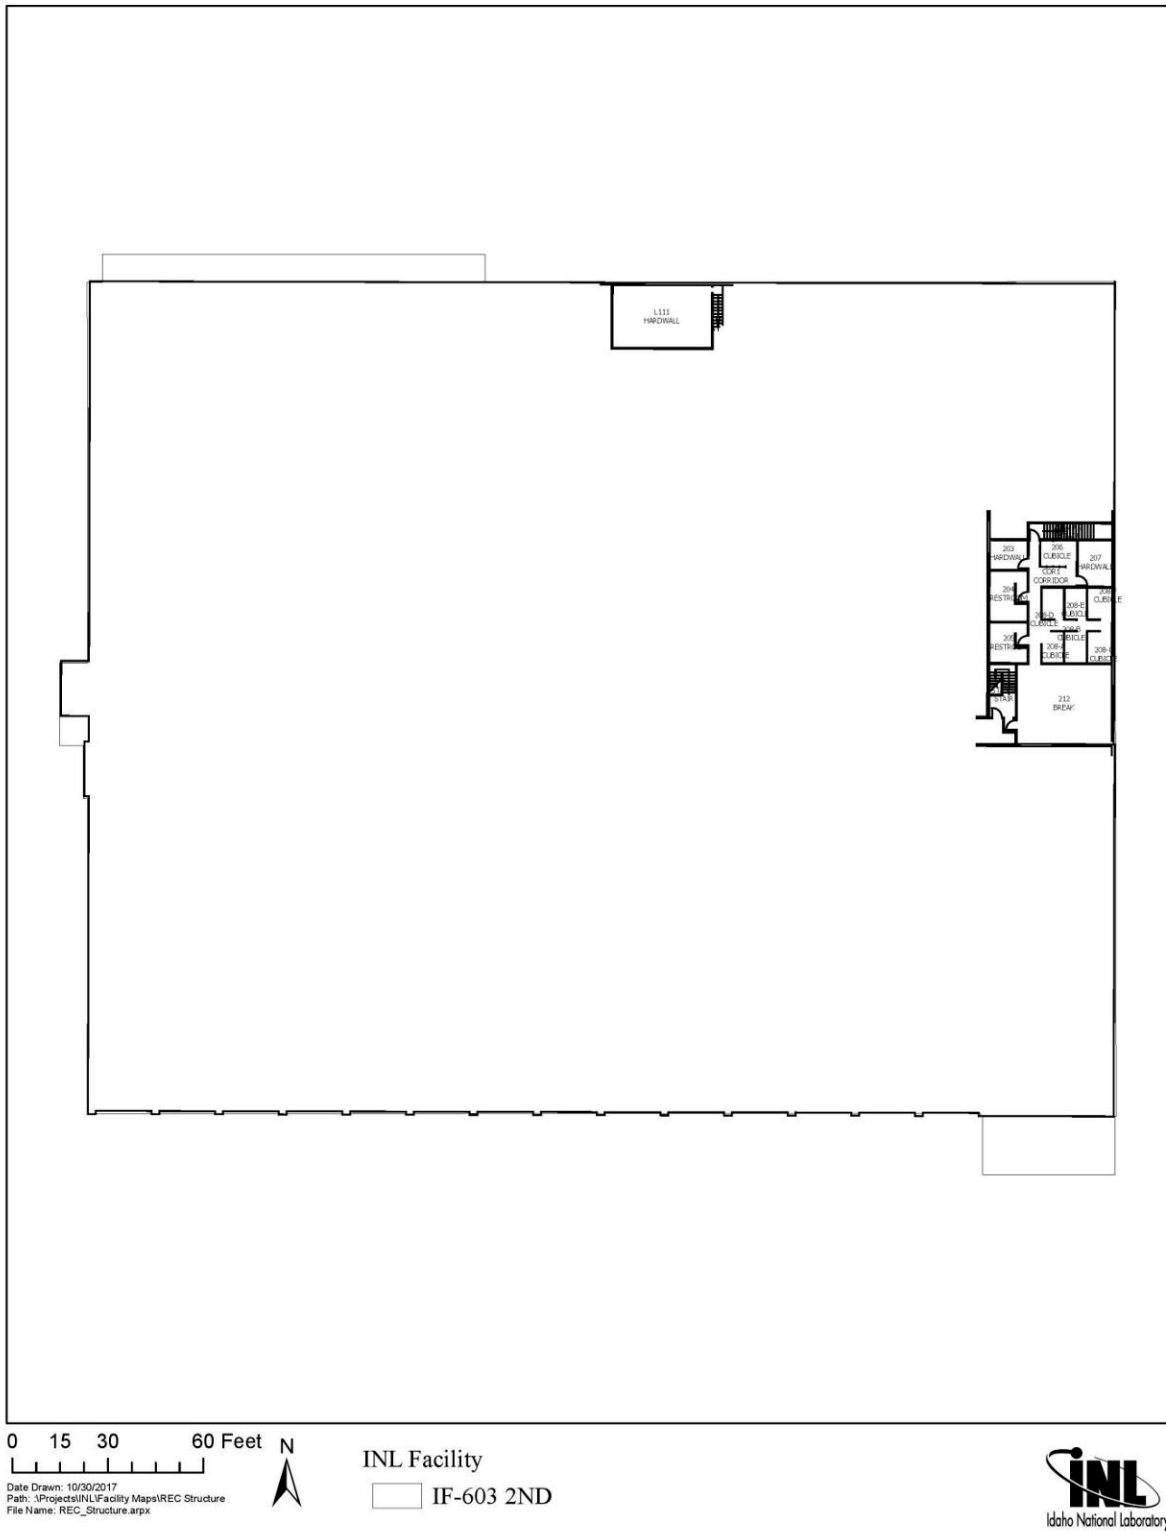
IRC Laboratory Building (IF-603) floor plan (2nd floor).
